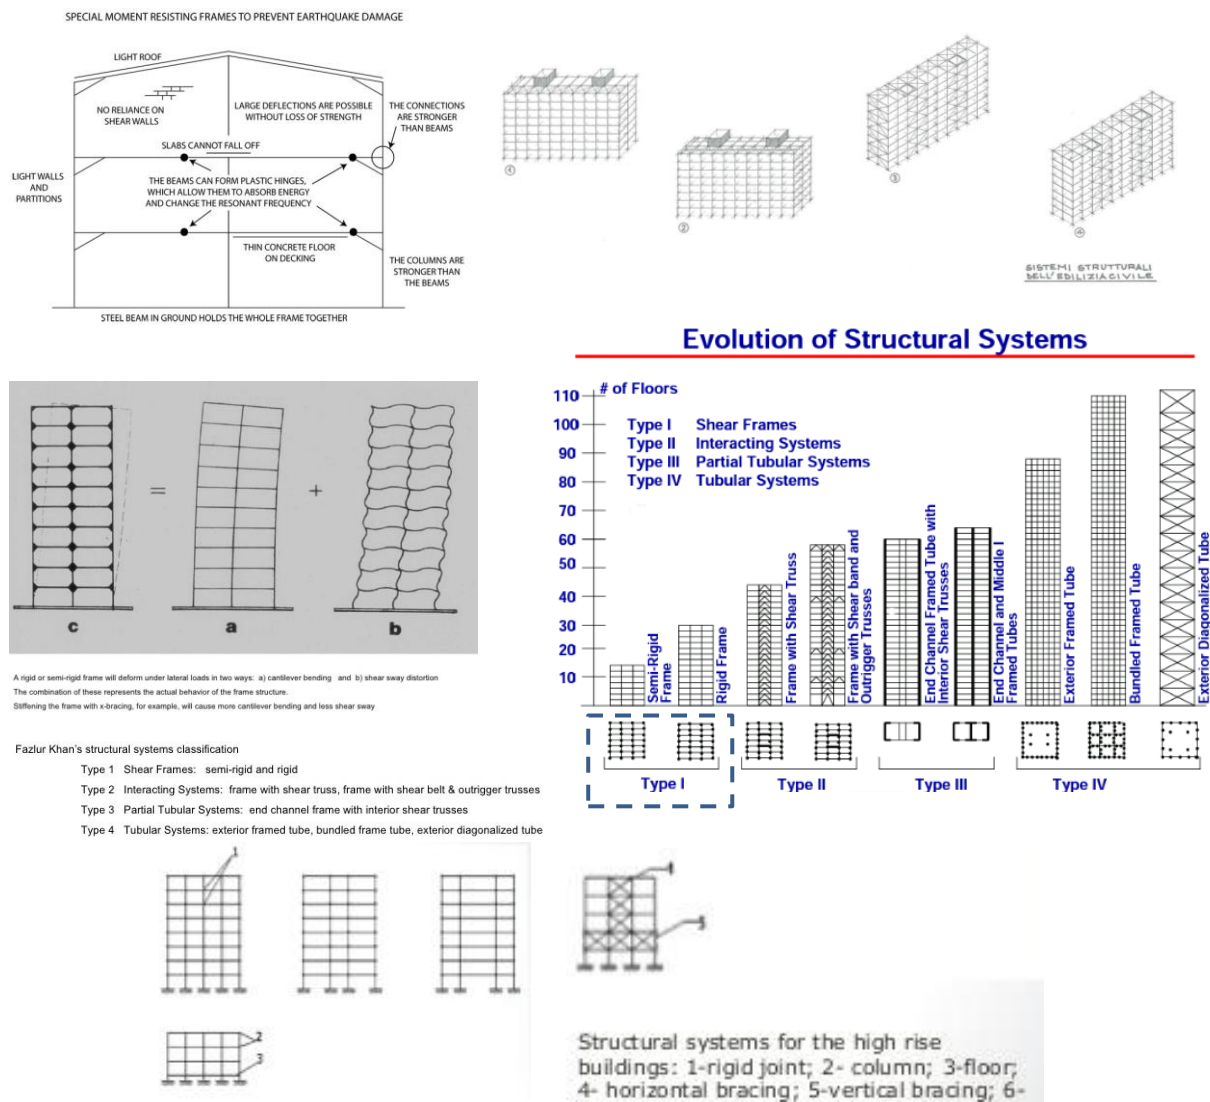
Steel frames for buildings: frame's system types, adapted from Google
